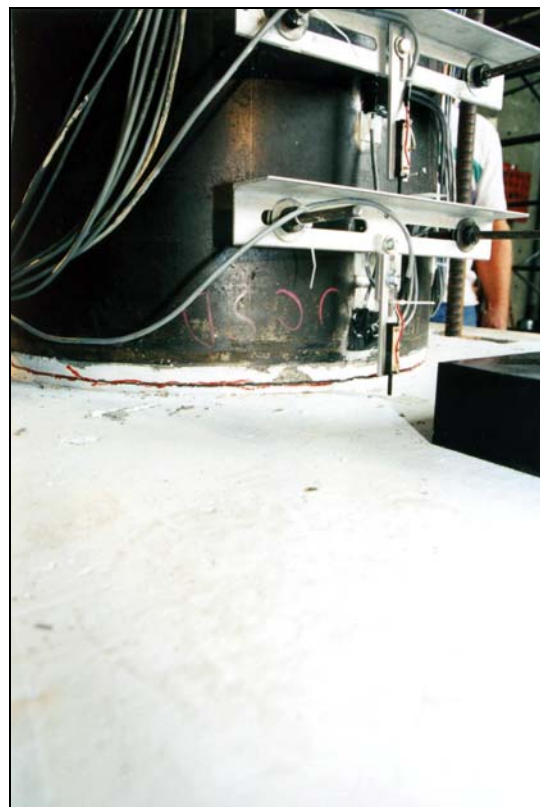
JH1 – Test 1 Spalling below jacket at 1.6% drift
